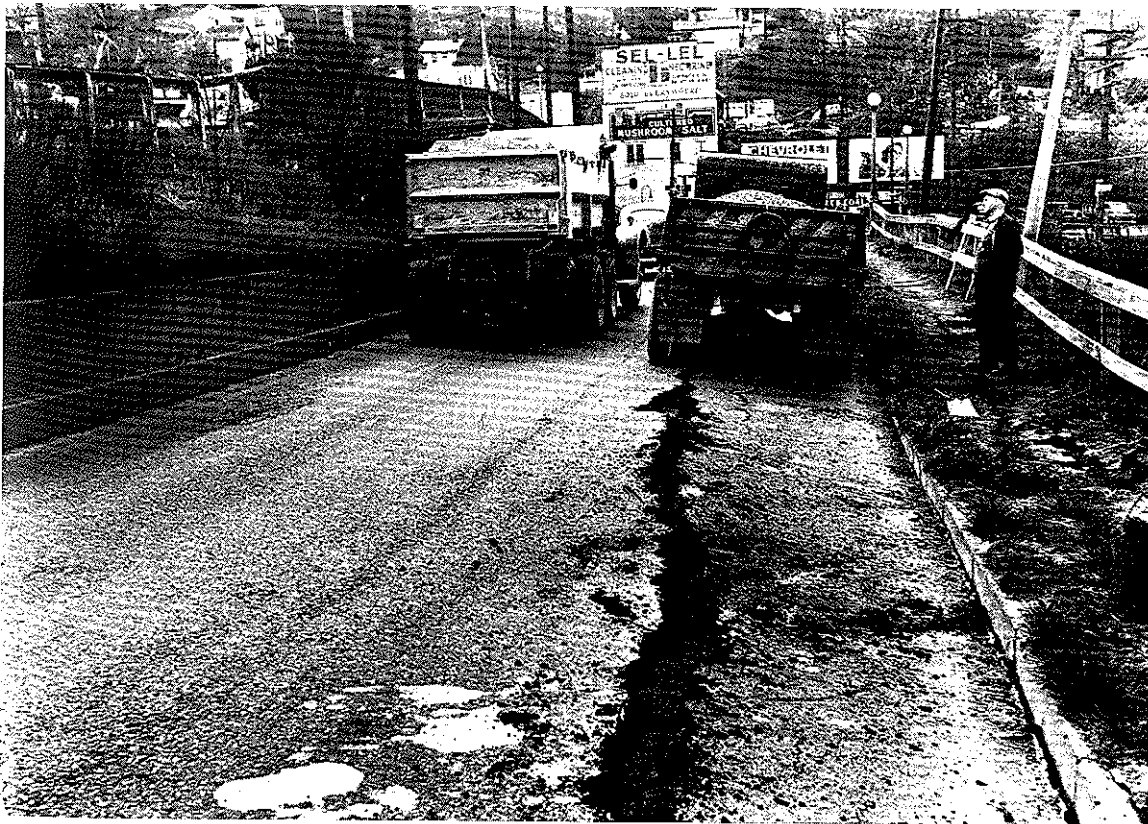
Ground failure along Spokane Street approach to West Seattle (pl. 4, loc. 16) triggered by the April 13, 1949, earthquake. Pavement cracks and slight slump are in a road embankment composed of artificial fill. Note arcuate scarp and tilted light pole at right. Photograph from the Seattle-Post Intelligencer Collection, courtesy of the Museum of History and Industry, Seattle, Wash.
